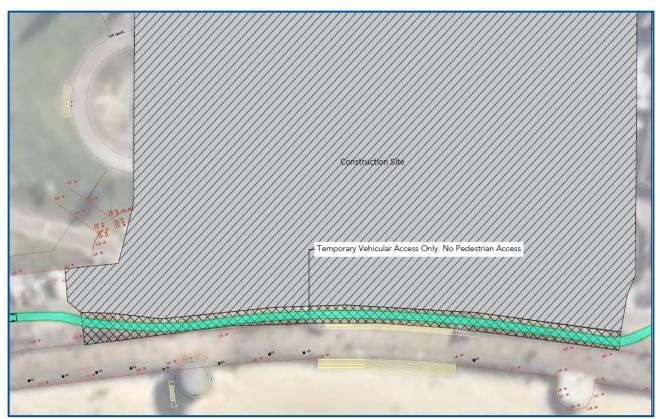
Stage 1 - Site Establishment and vehicular Access.
